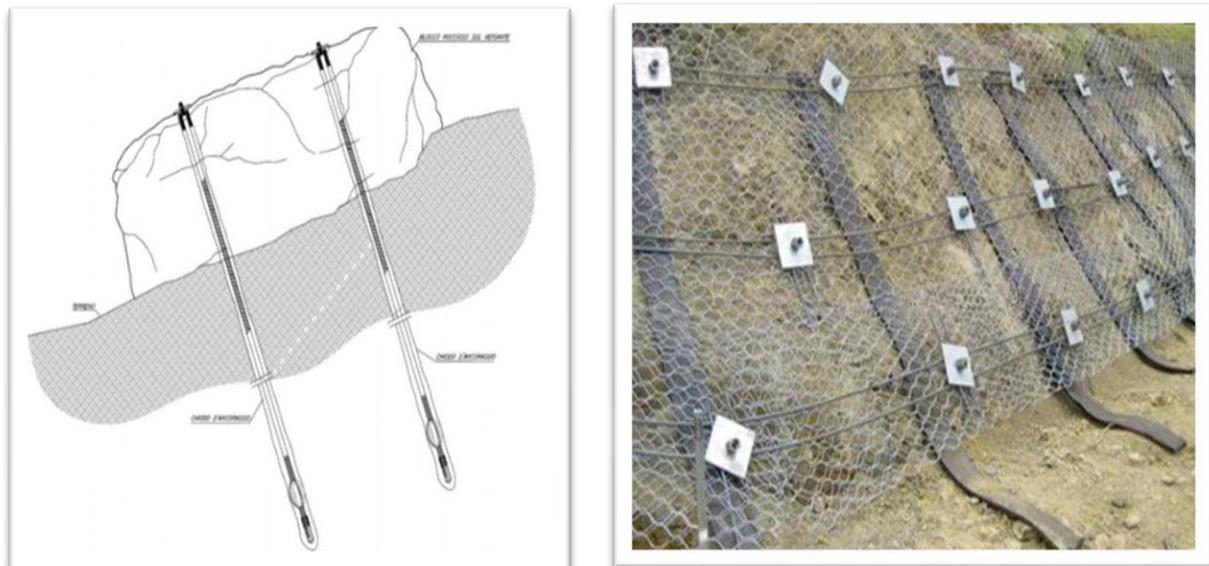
Rock Bolt Installation into Slope
